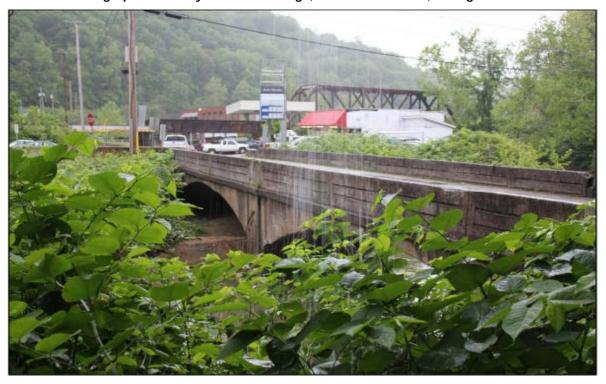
Mt. Gay Deck Arch Bridge, LG-0758/LG-0764, Facing North
